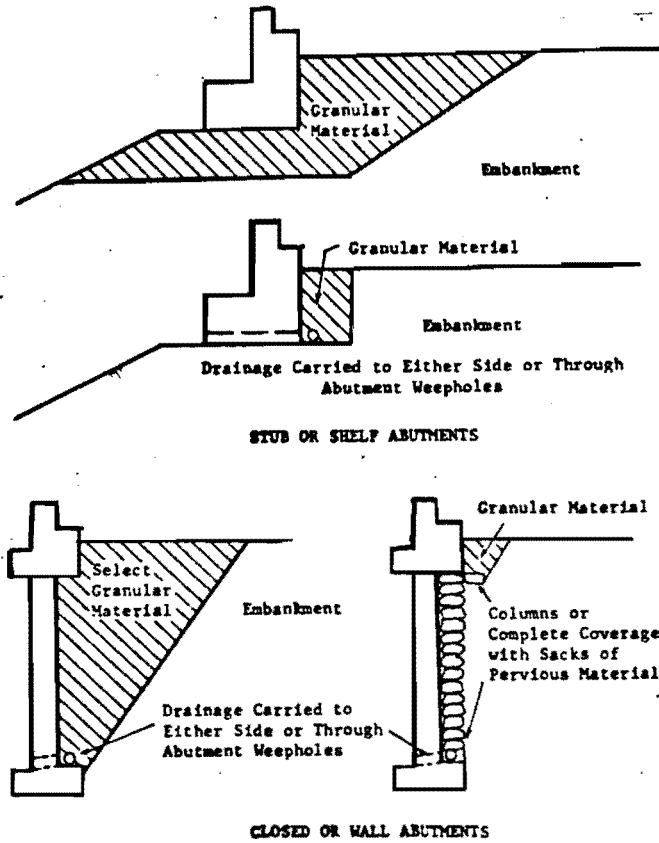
Typical methods used to provide abutment drainage (from Ref 2).
